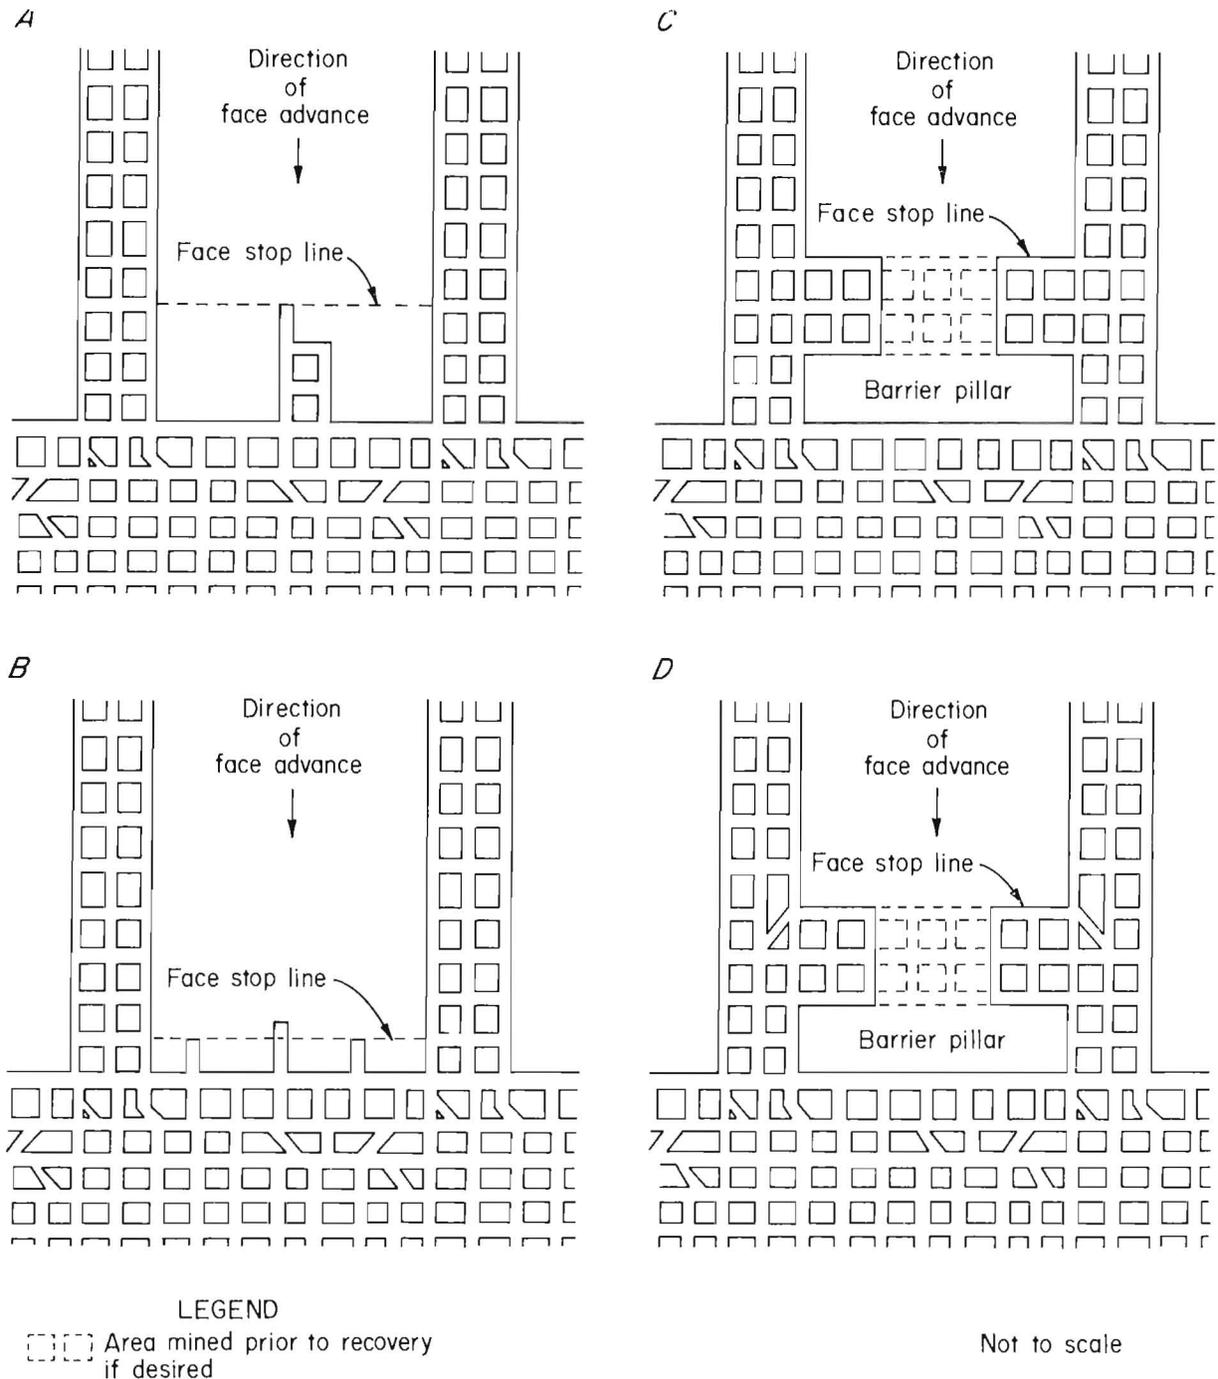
Conventional longwall equipment recovery methods. A, Barrier pillar access; B, stall (butt) access; C, chute access; D, angled chute access.
